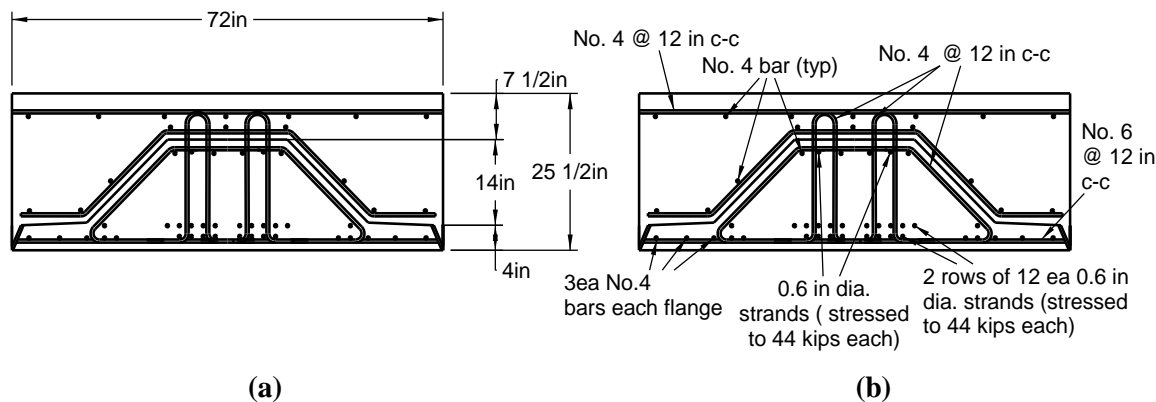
Virginia inverted T-beam with Welded Connection, a) Dimensions and b) Reinforcing
